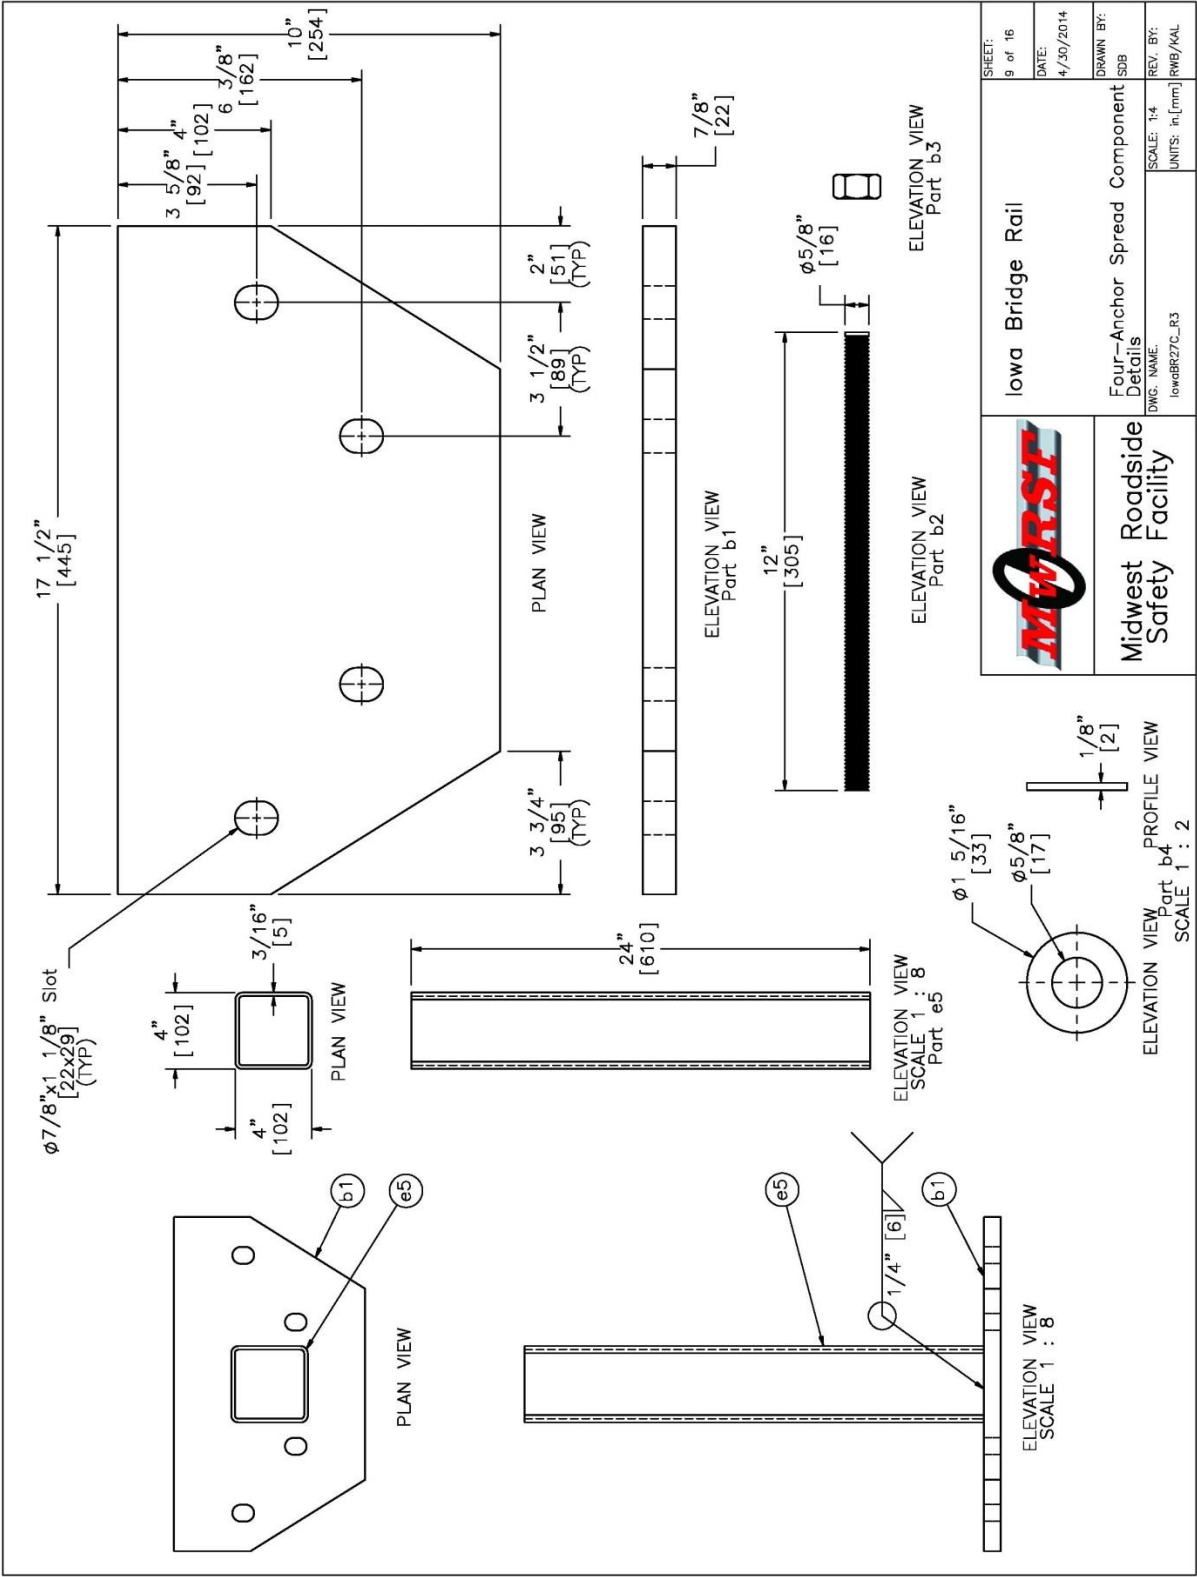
Four-Anchor Spread Component Details, Test No. IBP-2
